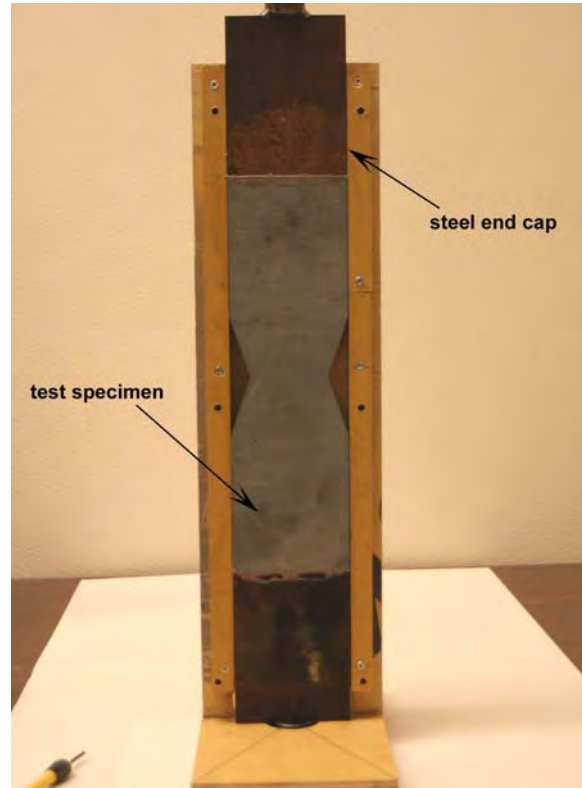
Direct tension specimen with epoxied steel end caps.
